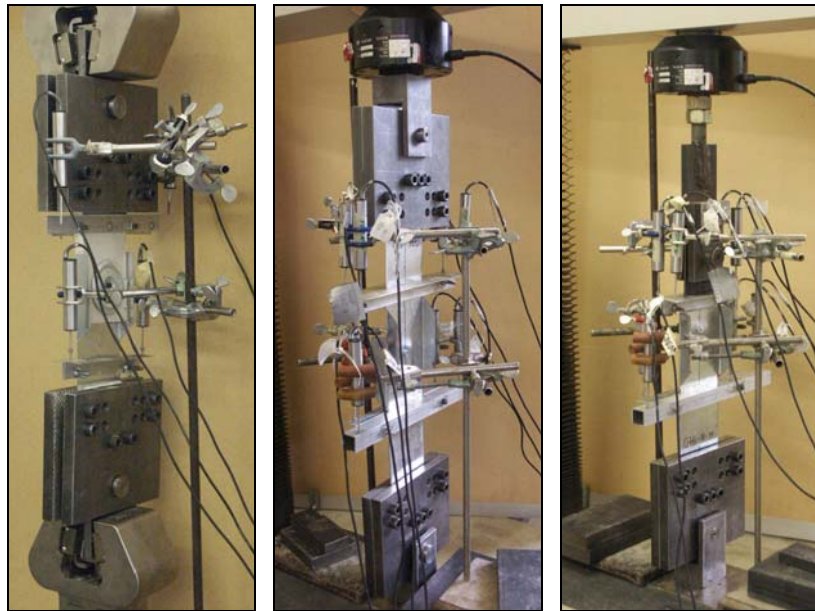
Connection test setups : a) gypsum-to-deck test; b) sidelap test; c) deck-to-frame test
